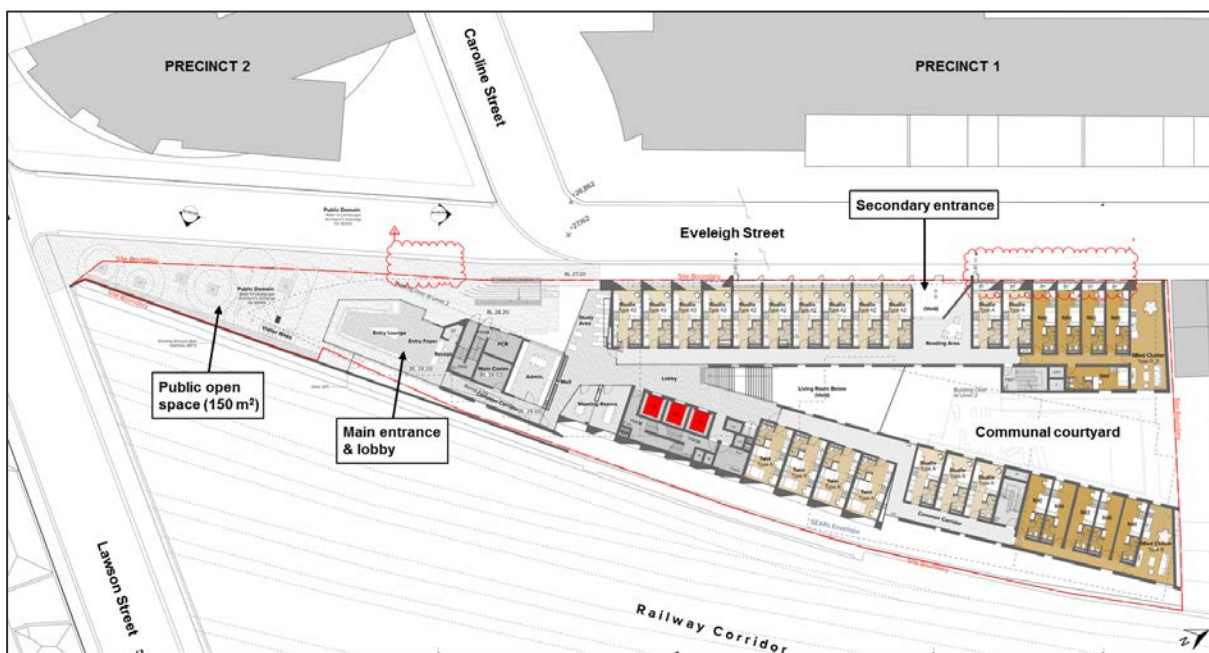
| Proposed upper ground floor student accommodation layout (SSD Application) (Base source: Applicant's RtS)
